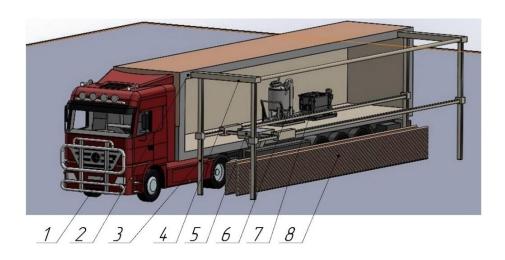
3D construction printer complex mounted on a cargo semi-trailer 1 – Truck tractor, 2 – Semi-trailer, 3 – Telescopic outriggers, 4 – Portal, 5 – Extruder, 6 – Concrete pump, 7 – Mixer 8 – Printed element
